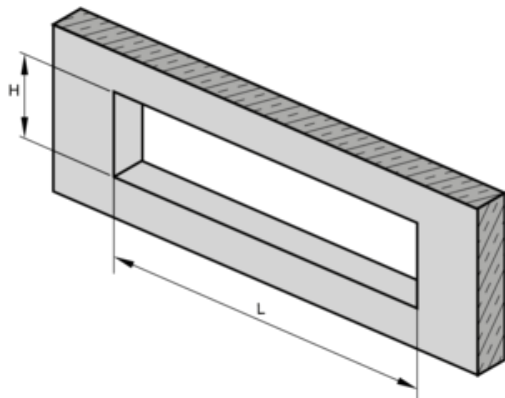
Installation opening with installation subframe -A1 and -B1 for fixing -VS
